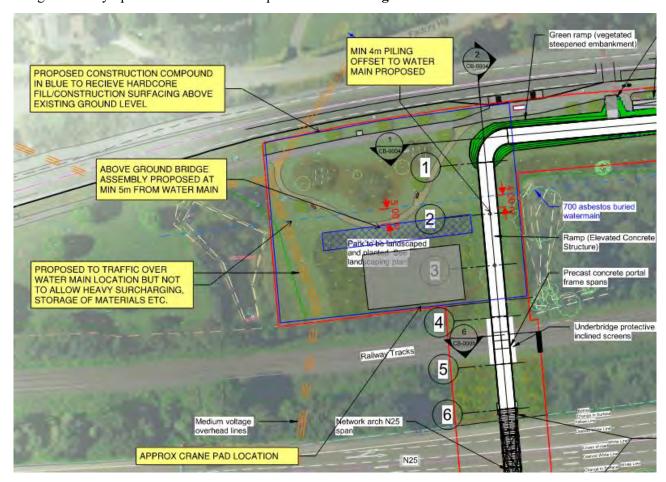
Proposed easement to underground water main running through bridge assembly area
